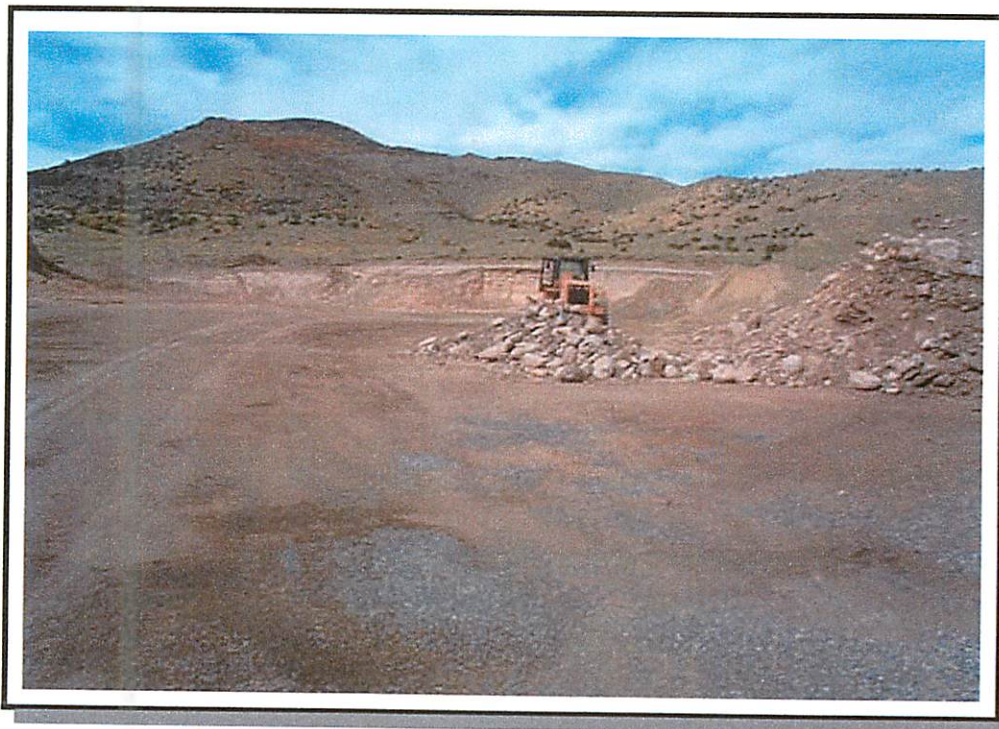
Active Gravel Pit on the Homansville Property, Just North of U.S. Highway 6
